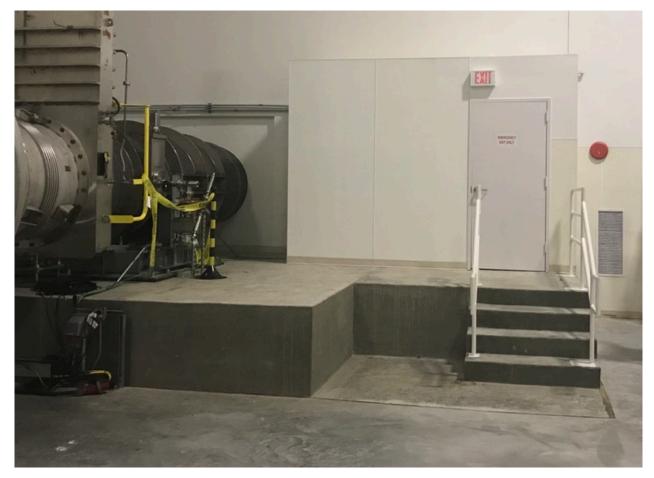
Livingston LVEA +Y wall. Main Y beamtube is shown at left as it enters the BTE (Figure 6). New FC tube penetration may intersect the existing exit door, pictured at right. Access door into new FCTE is required to the left of this. Top of raised concrete slab is approximate BTE and new FCTE floor level.
